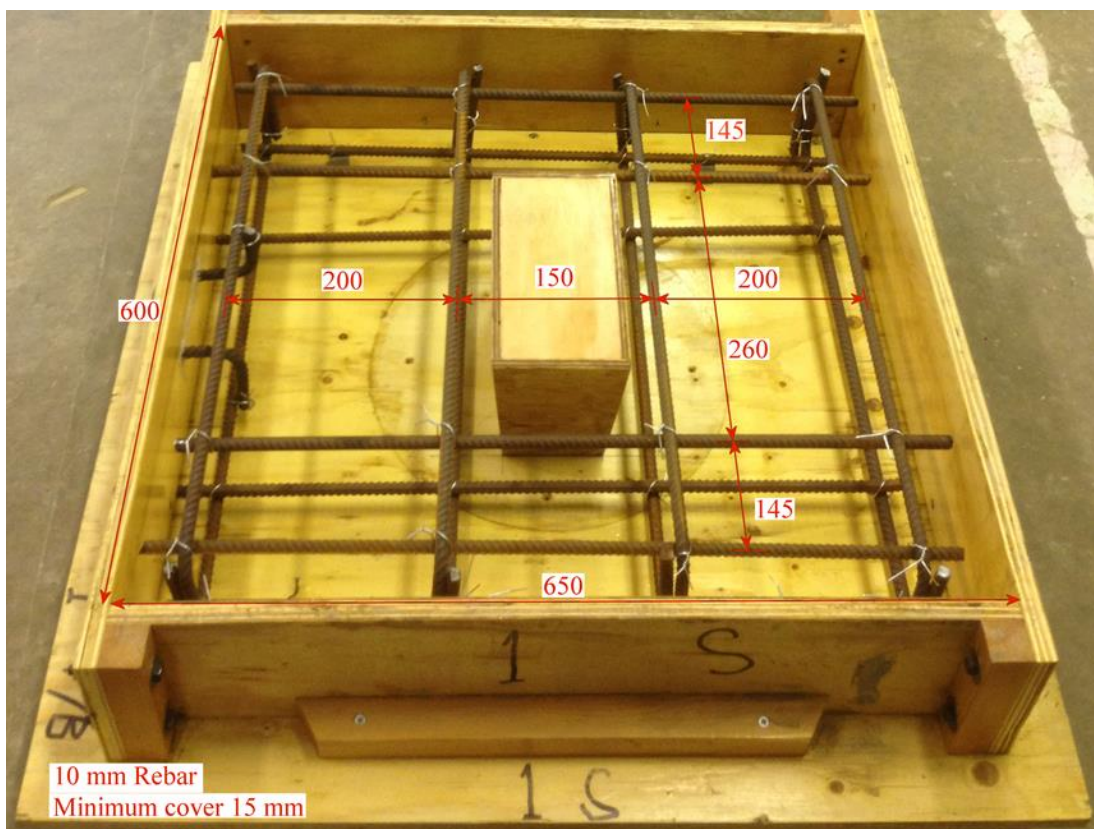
Reinforcement used in FBSC pushout Test 4
